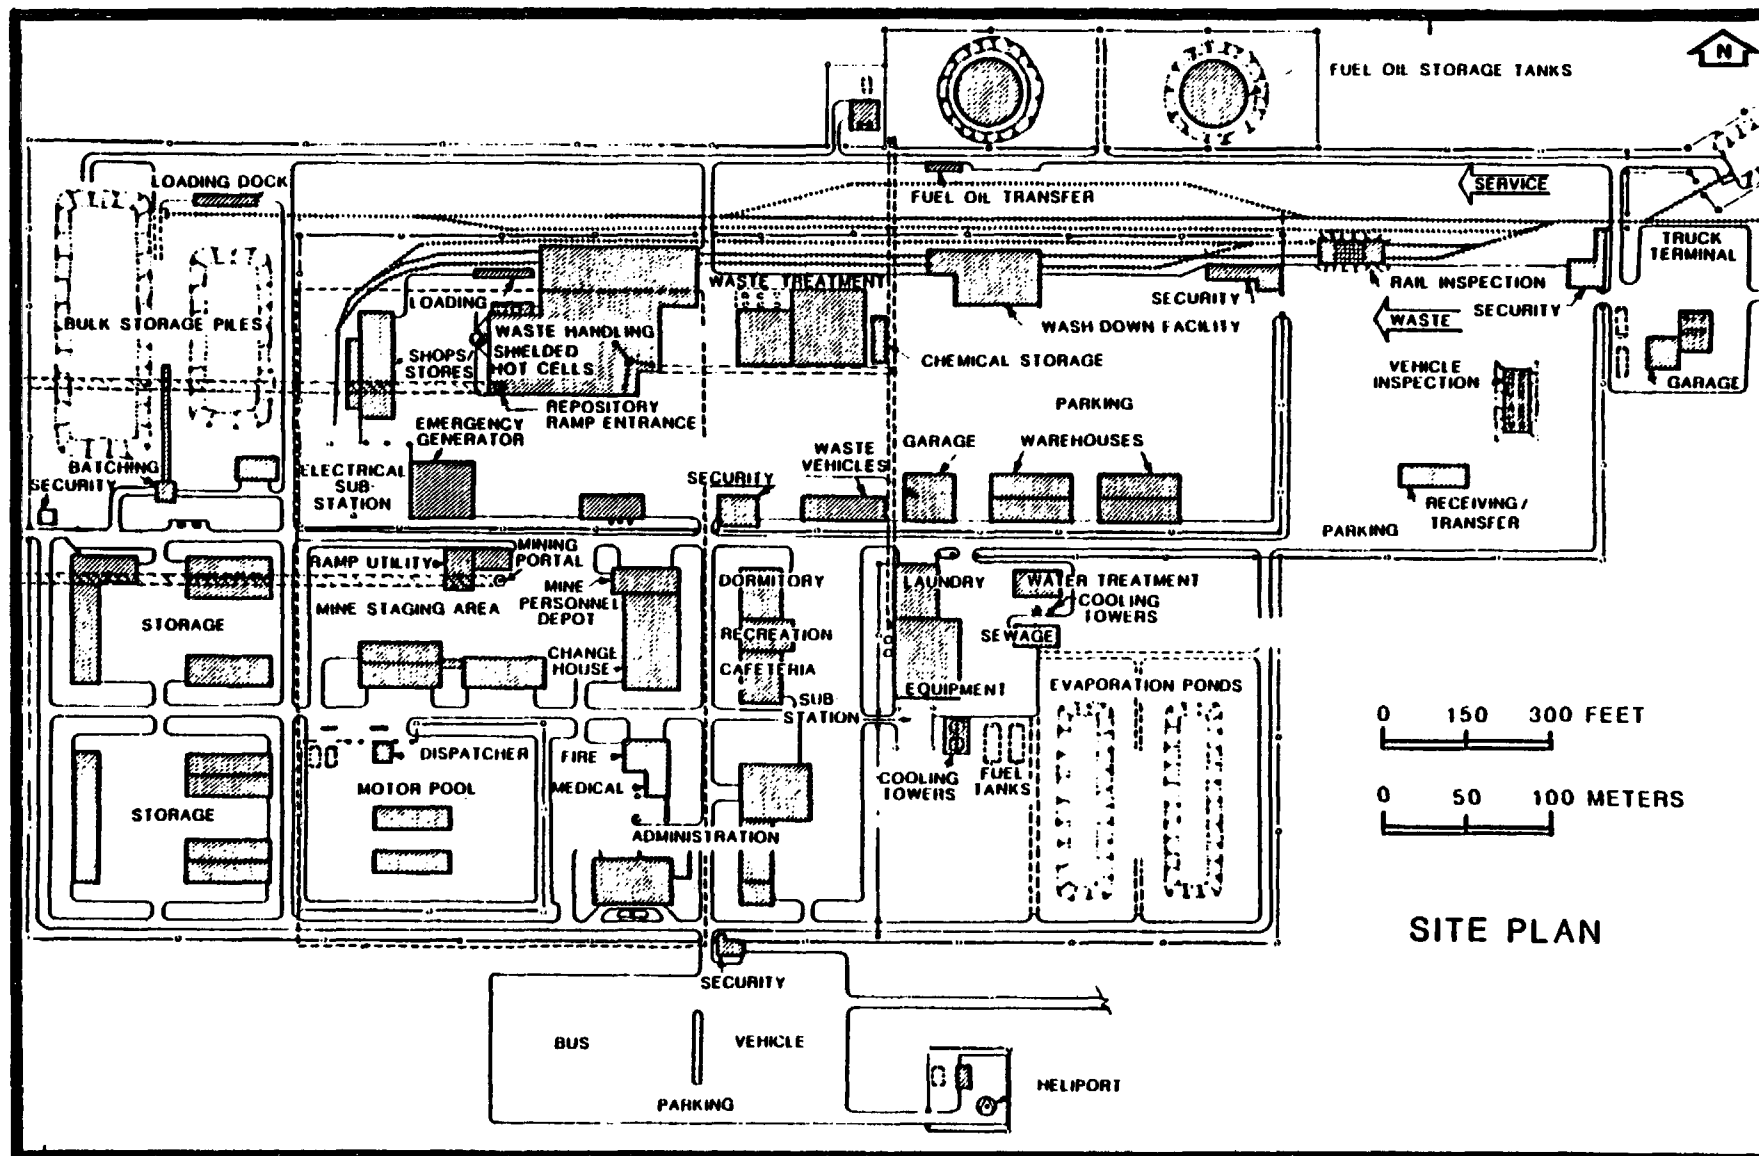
Preliminary site plan for the Yucca Mountain repository.
